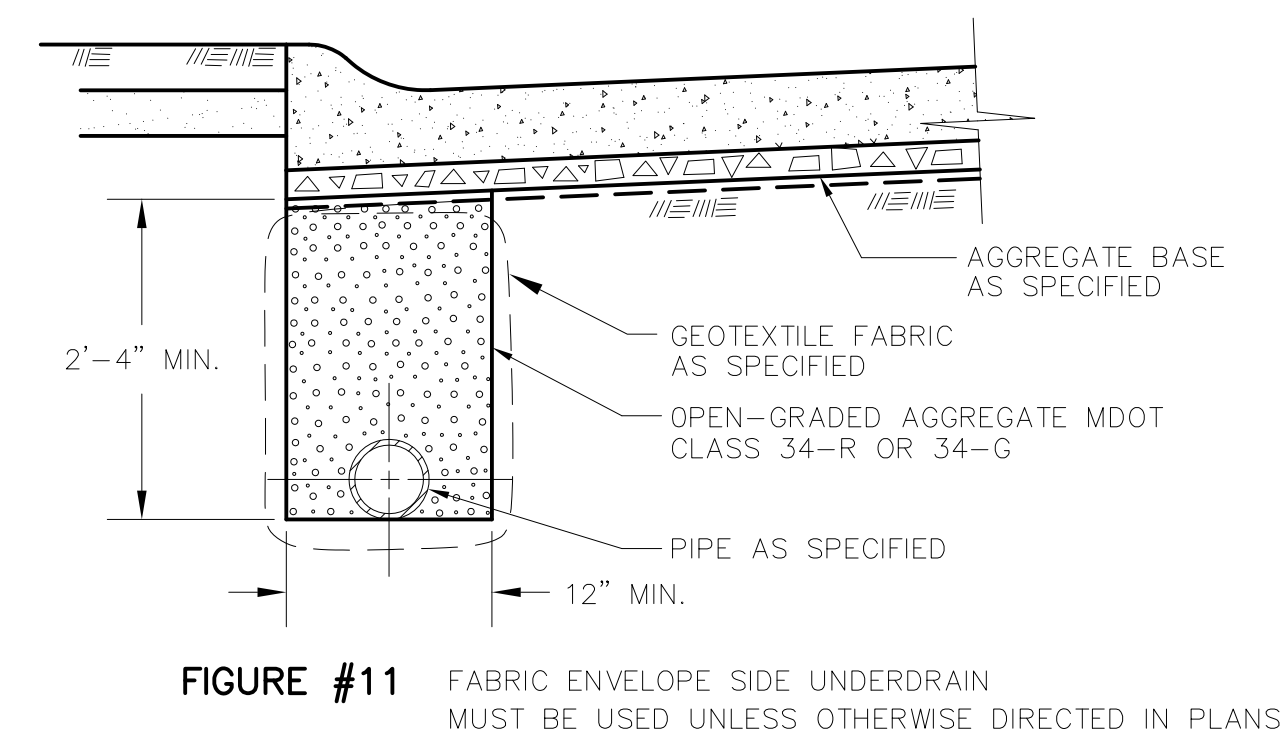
FABRIC ENVELOPE SIDE UNDERDRAIN MUST BE USED UNLESS OTHERWISE DIRECTED IN PLANS
